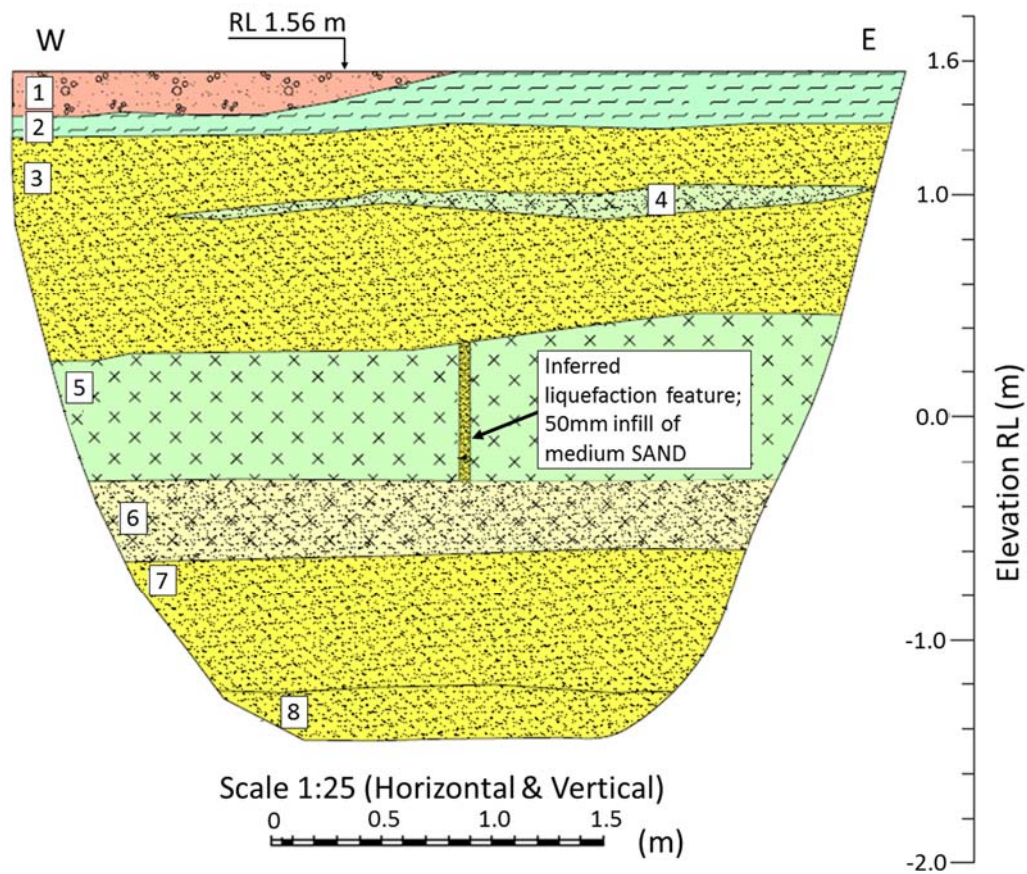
Cross-section of the excavation trench at the 3-RIC-1 Test Panel. Modified from van Ballegooy et al. 2017.
